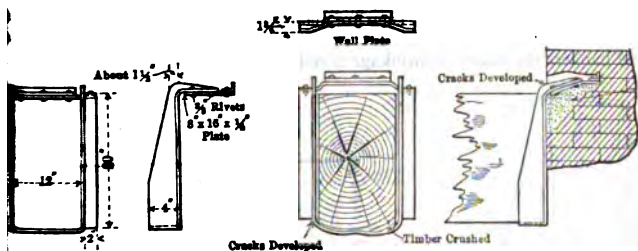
Failure of Steel Stirrup Wall-hanger
